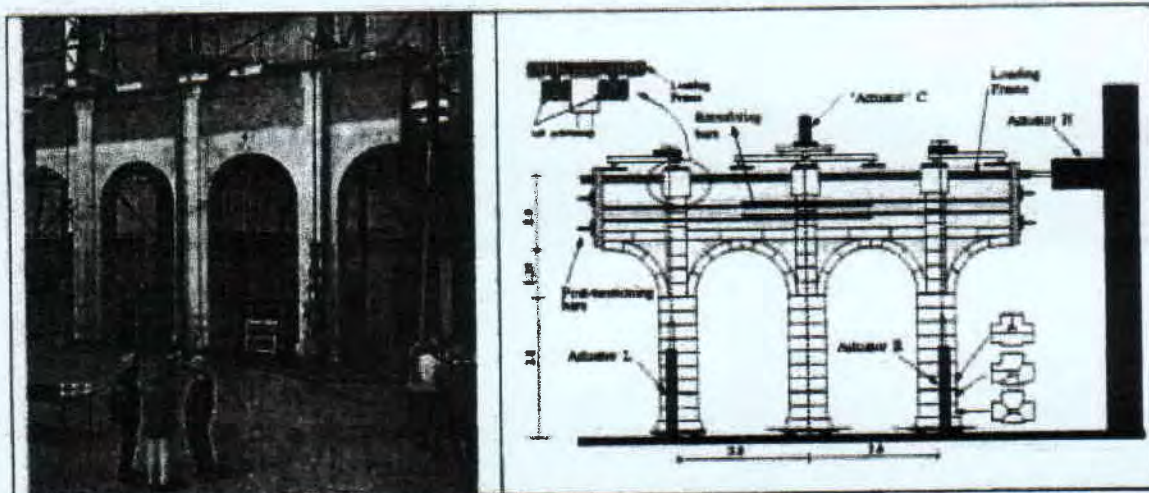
Façade full-scale model in the ELSA reaction wall laboratory (left) and test set-up - schematic (right)
